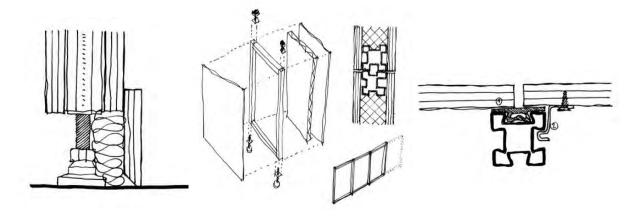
Sketches of detailing of interior wall components using the GIS profiles of Geberit
